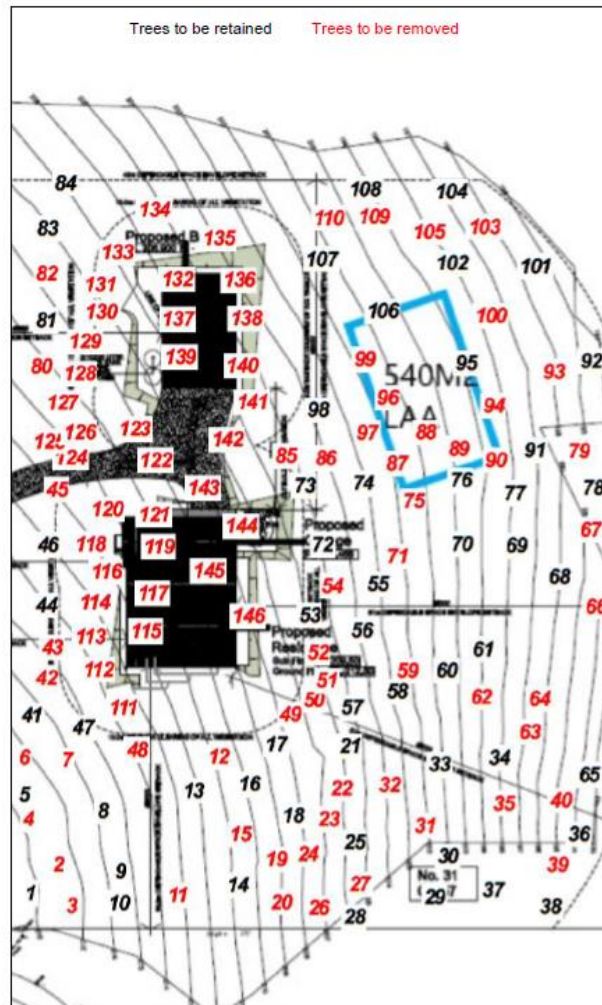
Tree Removal Plan (The Green Connection, Version 2, February 2022)
